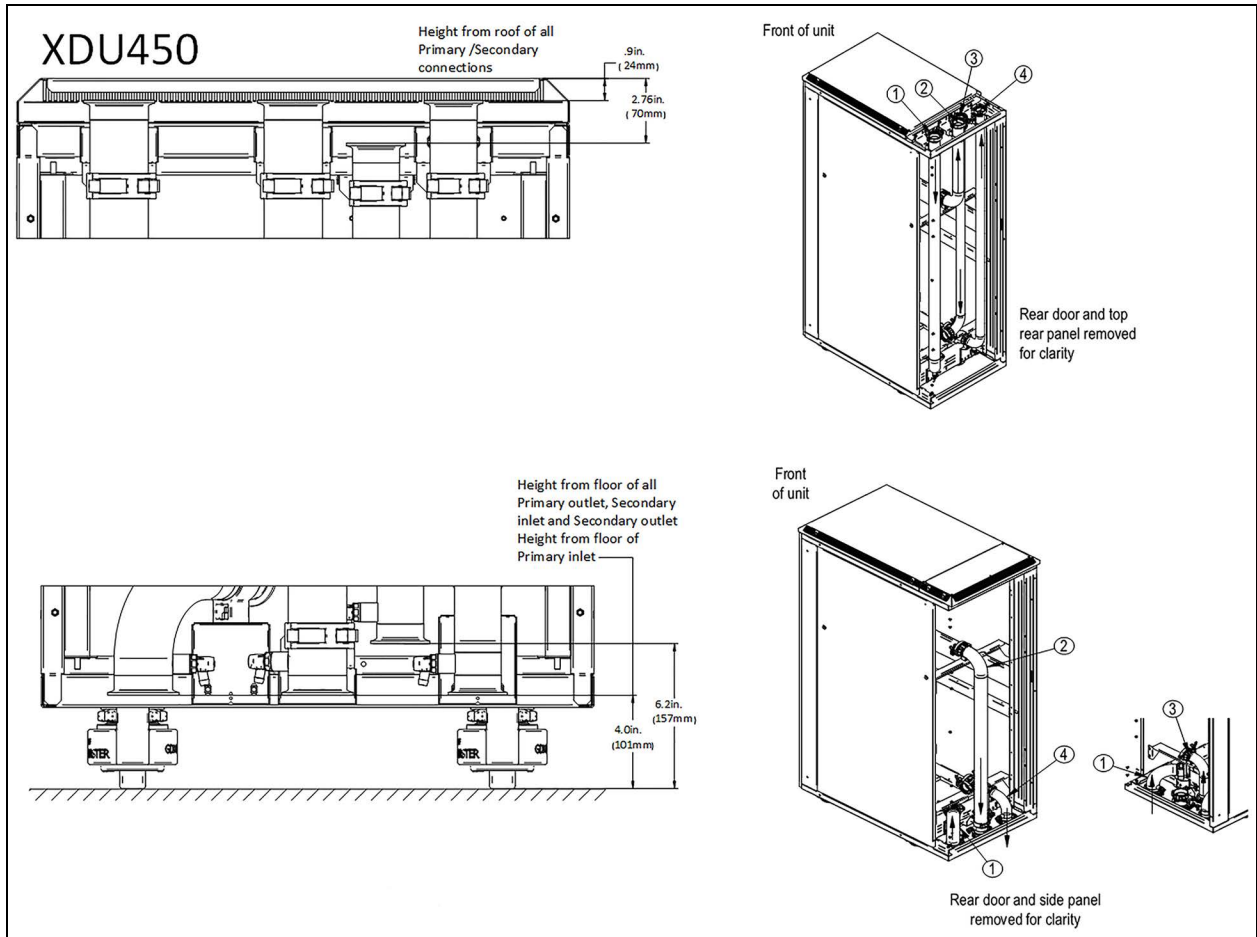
Rear Section Showing Primary Facility and Secondary Pipe Connection Locations
